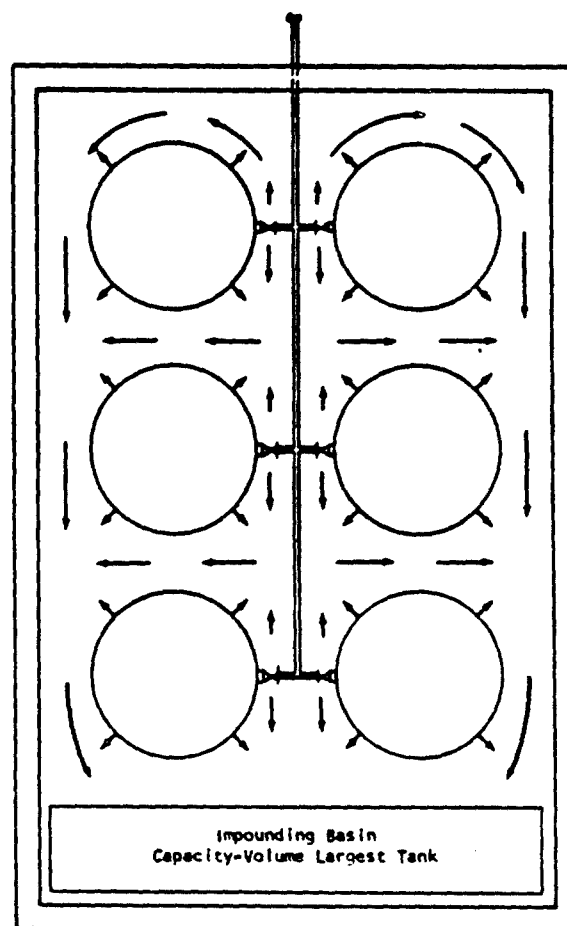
The newer concept of tank field layout and drainage, including remote impound.
